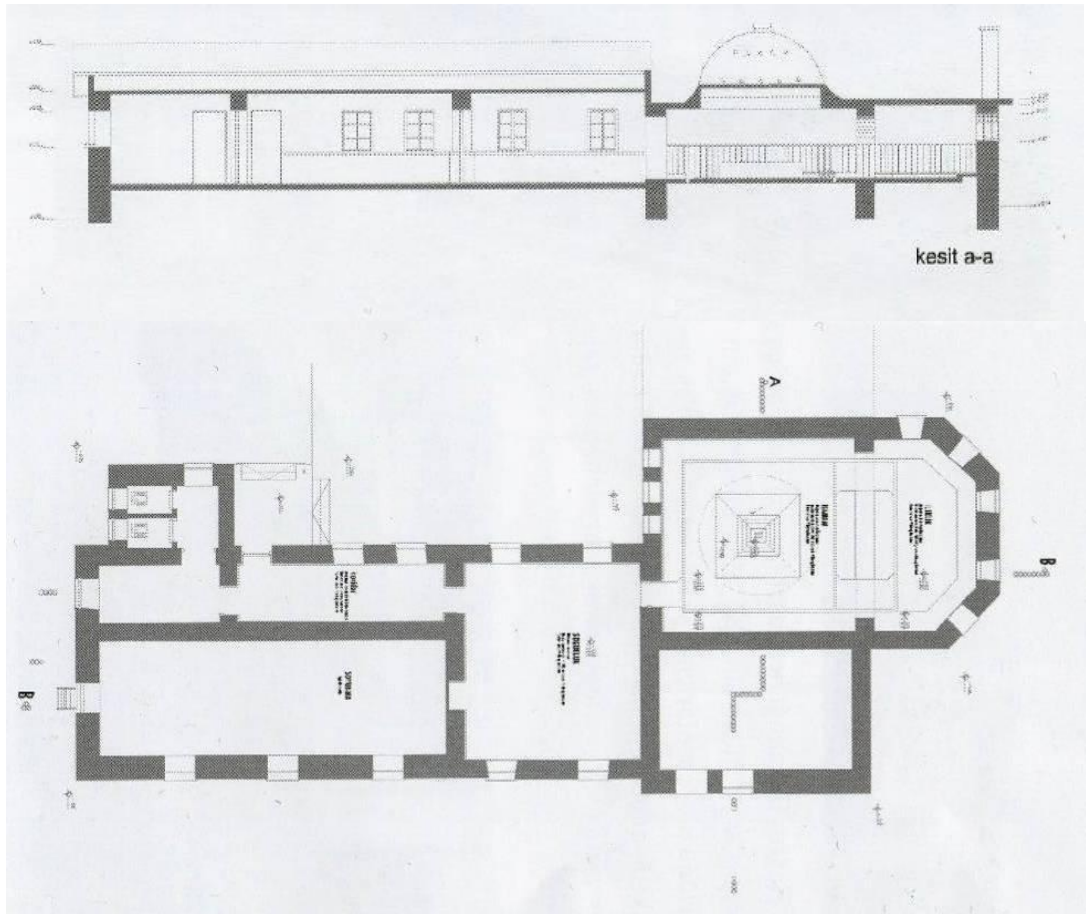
Plan and section drawing of the Hamam in Hasanoğlan
